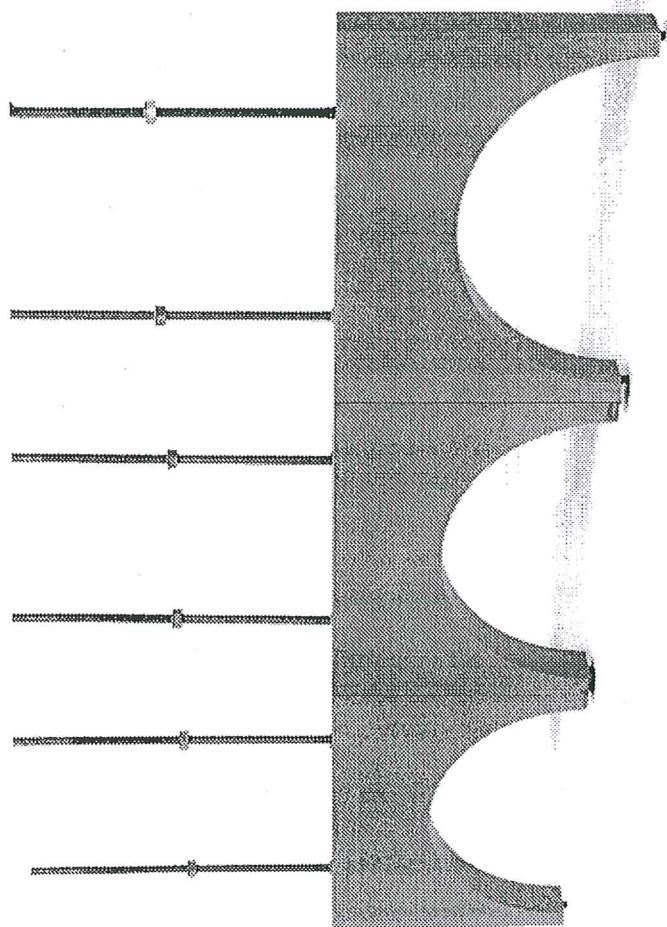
MULTIPLE SEMI-CIRCULAR ARCHED BRIDGE
